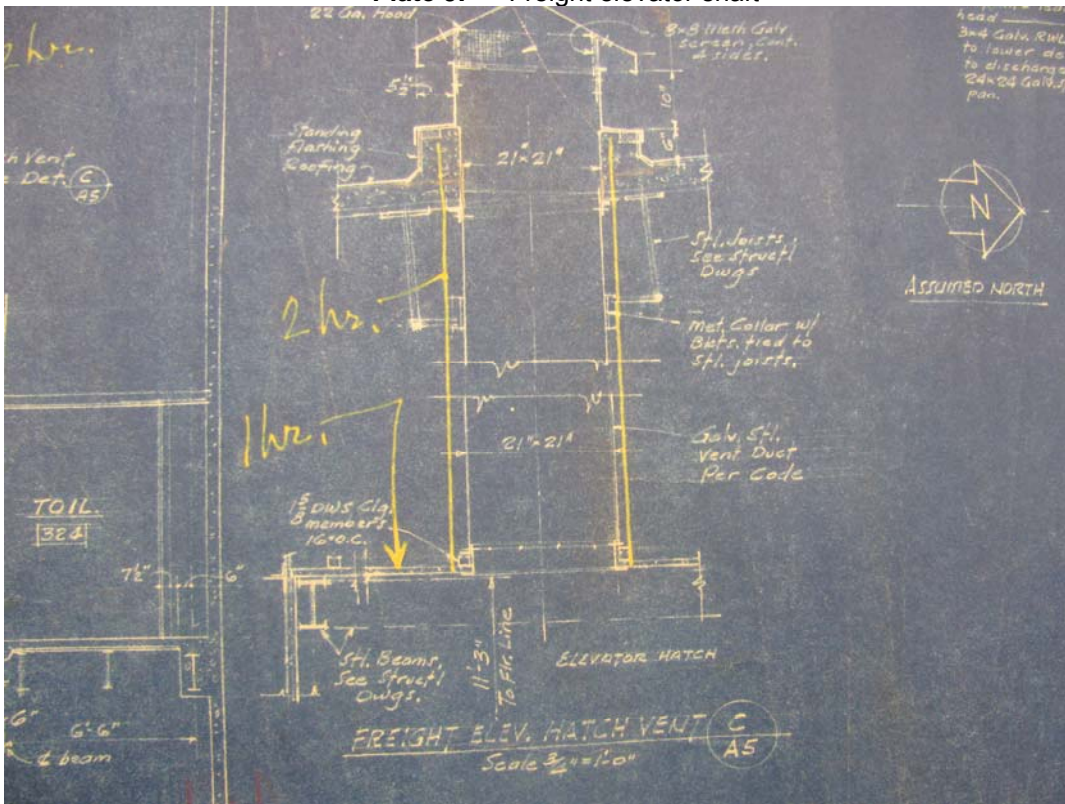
Freight elevator hatch vent plans, Red Cross Building
